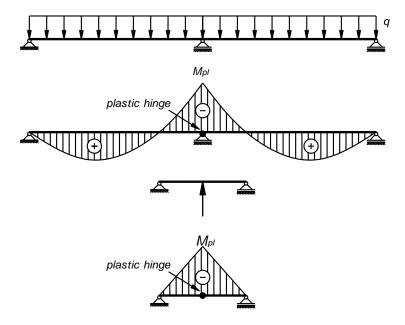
Simplification of the problem from a continuous beam to a simply supported beam
